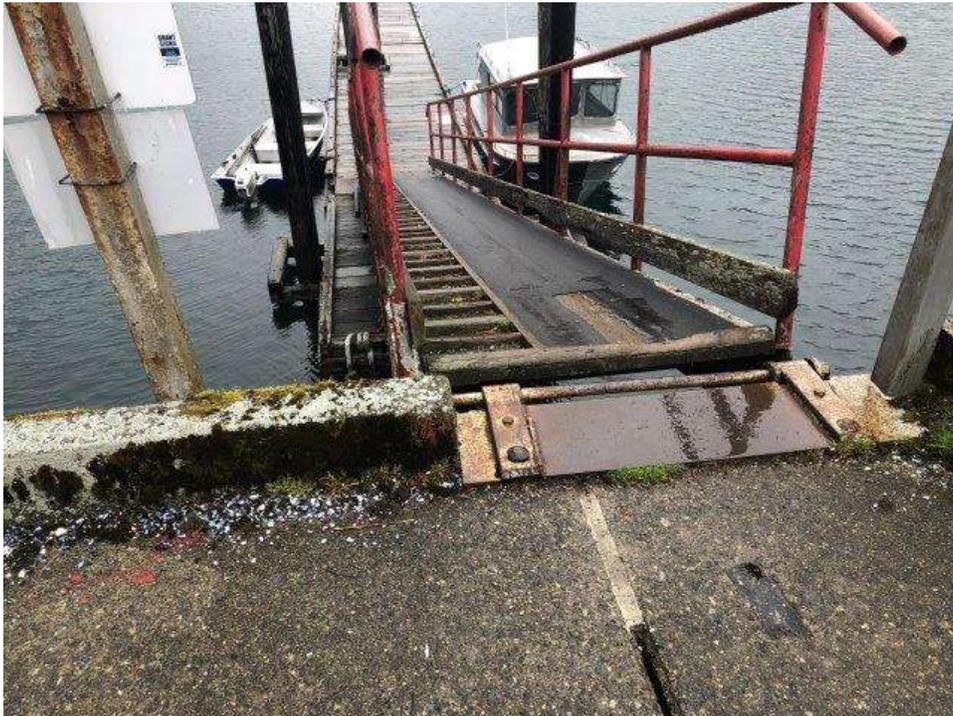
Wharfhead Topsides and Building Structure (Facing South)
